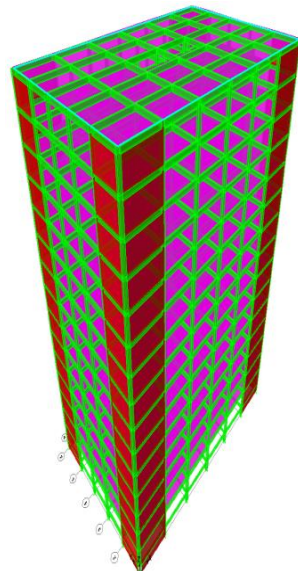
3D elevation view of G+14 storey RCC building with ESW
